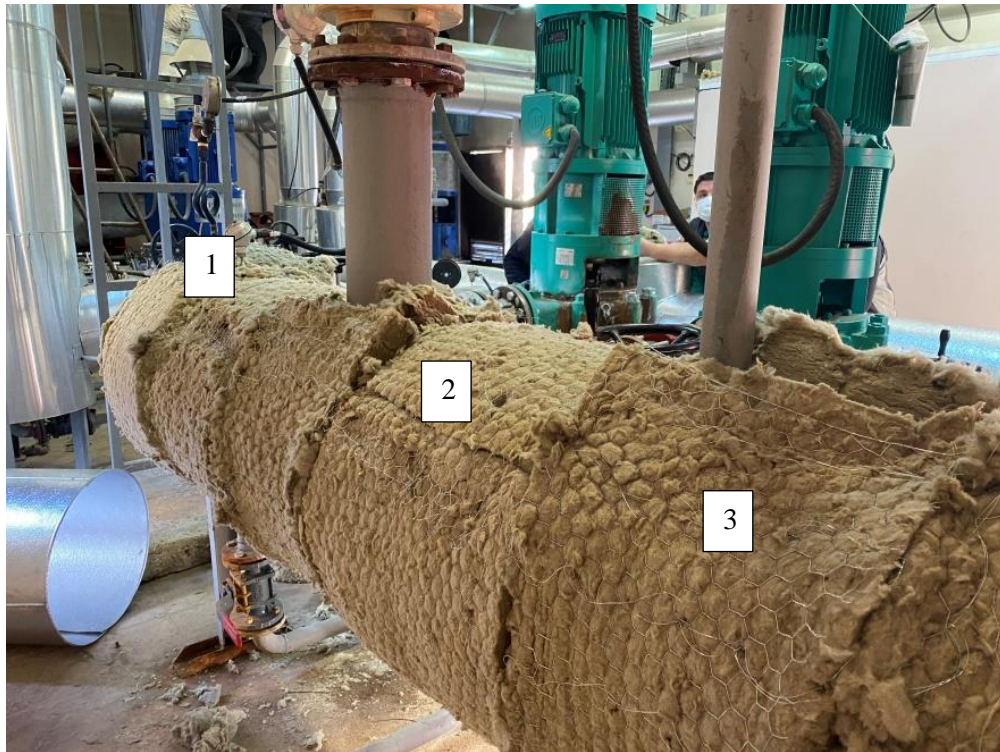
Picture of the test setup with rock wool and measuring points in BD11 well.
